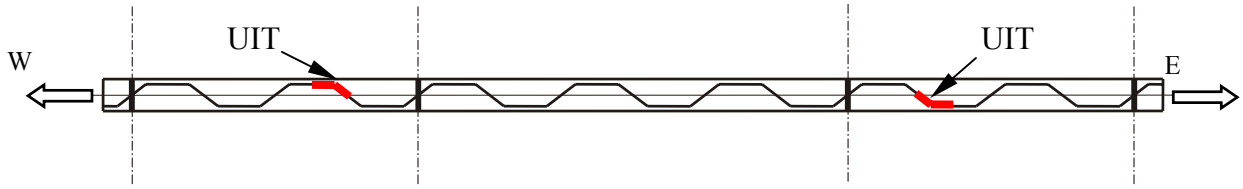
Locations of UIT of web-to-bottom-flange fillet weld.
